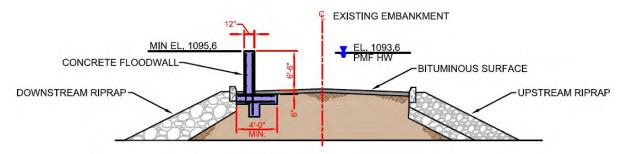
Cherokee Dam - Concrete Floodwall Concept for North Embankment (Segment C-1). The South Embankment (Segment C-2) would be similar except the walkway surface would be raised 3 feet.
